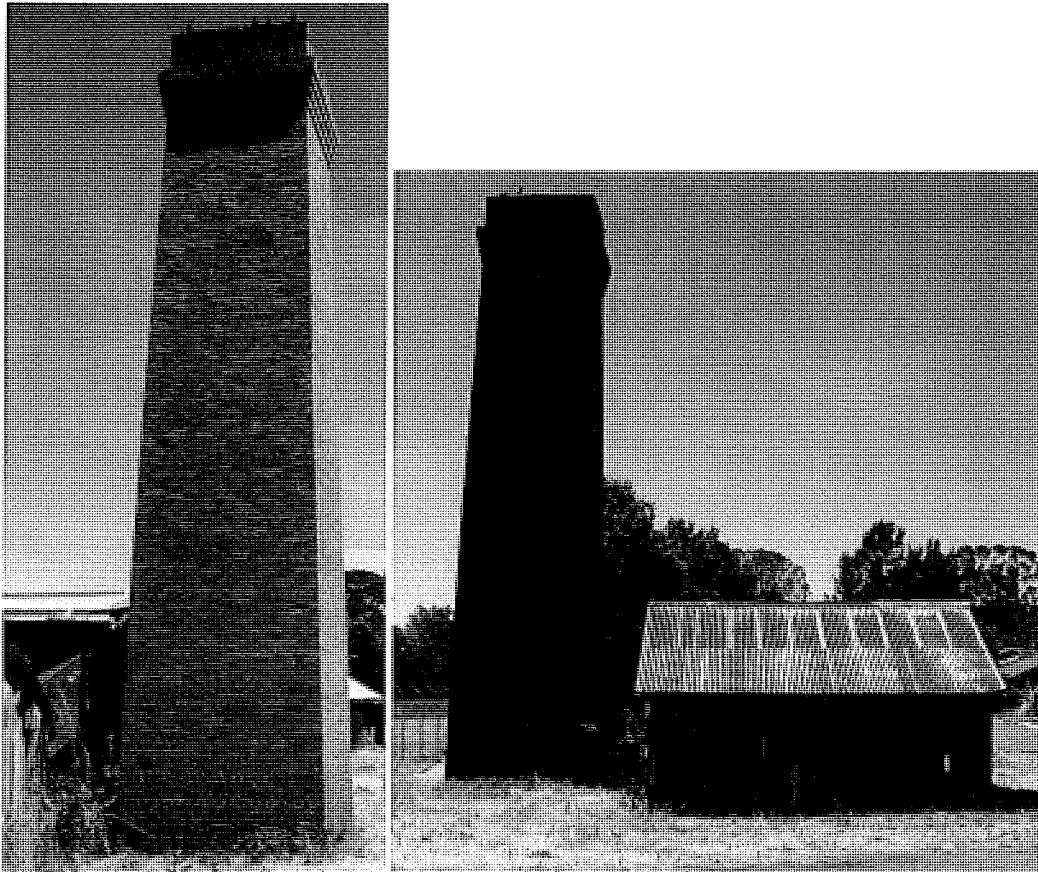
Left: North elevation. Right: South elevation with the 1955 fan house adjoining.
